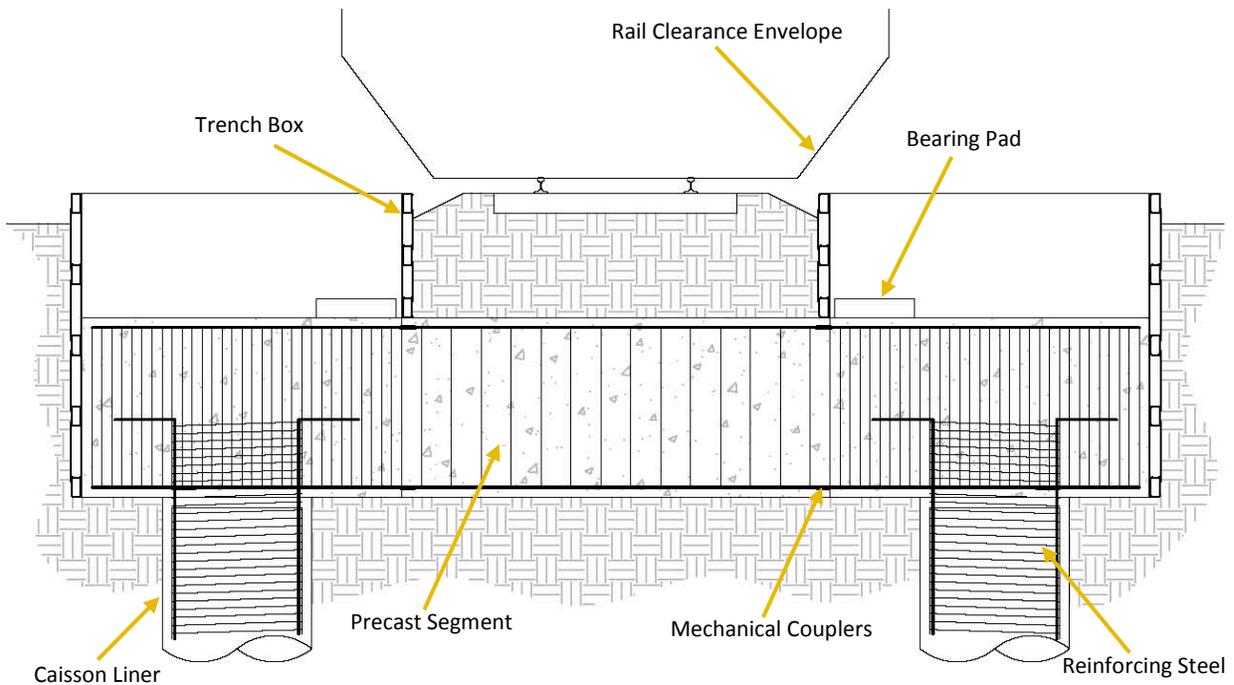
Cross-section of precast assembly after abutment extensions are poured
